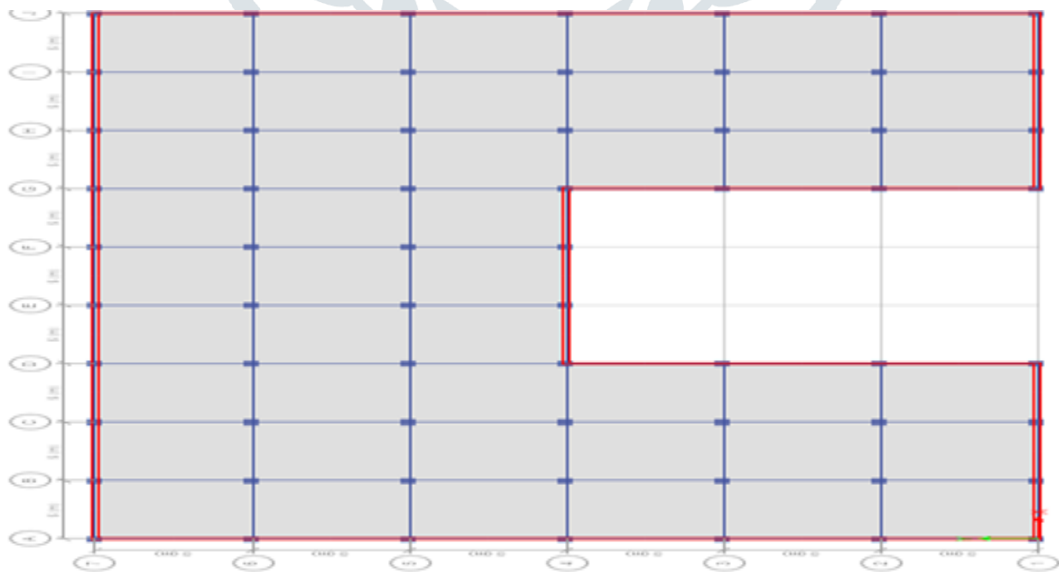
Plan view of C-Type with Shear wall at Alternate floor with blast loading
